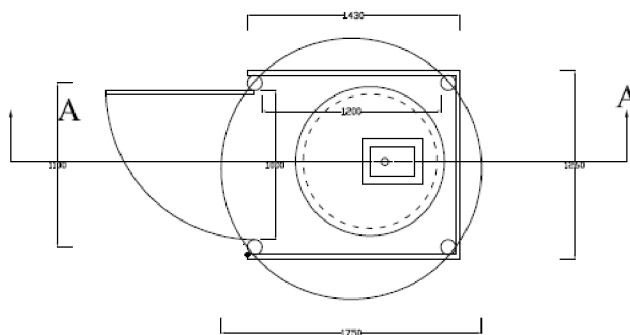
Plan of Direct pit of bamboo lining toilet (source: DWSS)
